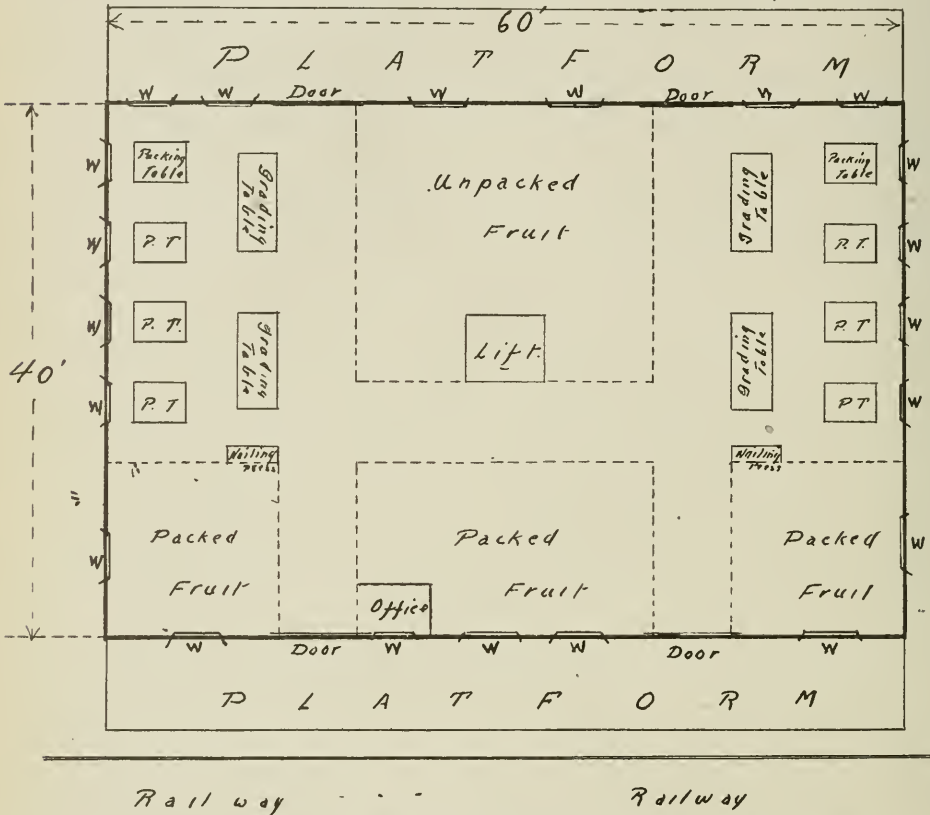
Ground plan of a Packing House, 40' x 60'.
